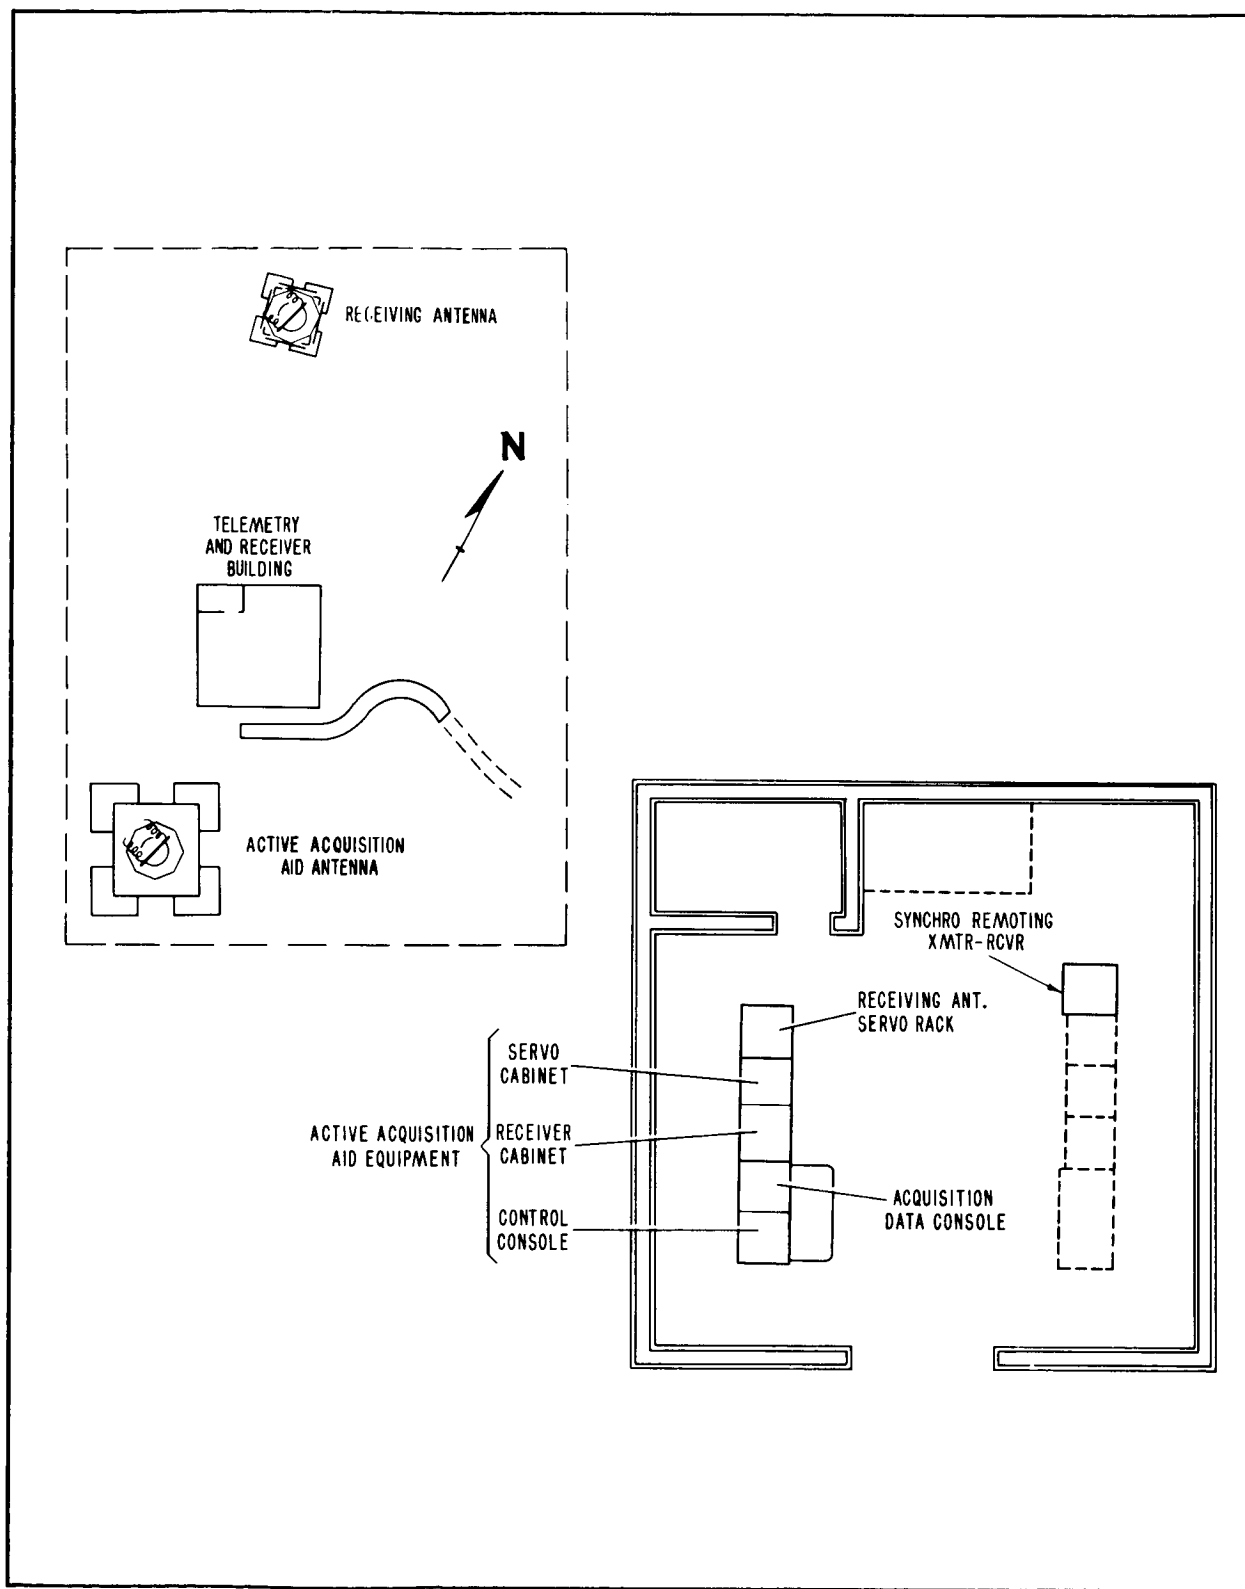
Site and Acquisition System Equipment Layout, Telemetry and Receiver Building, Town Hill
